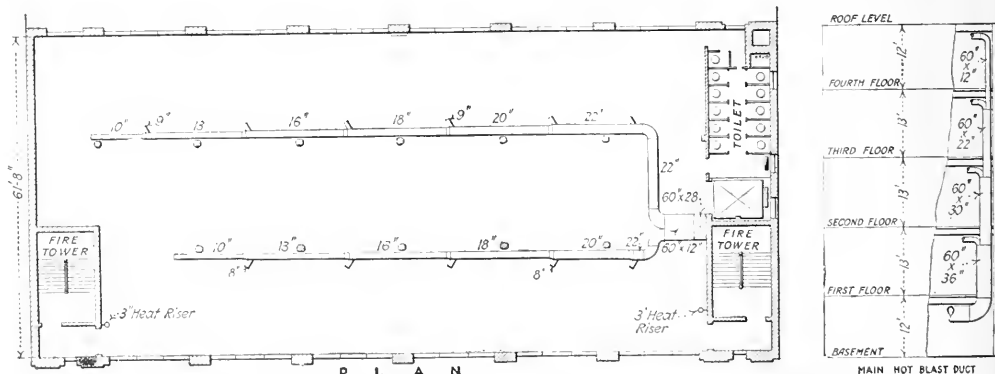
PLAN AND ELEVATION OF THE HOT-AIR DUCTS
